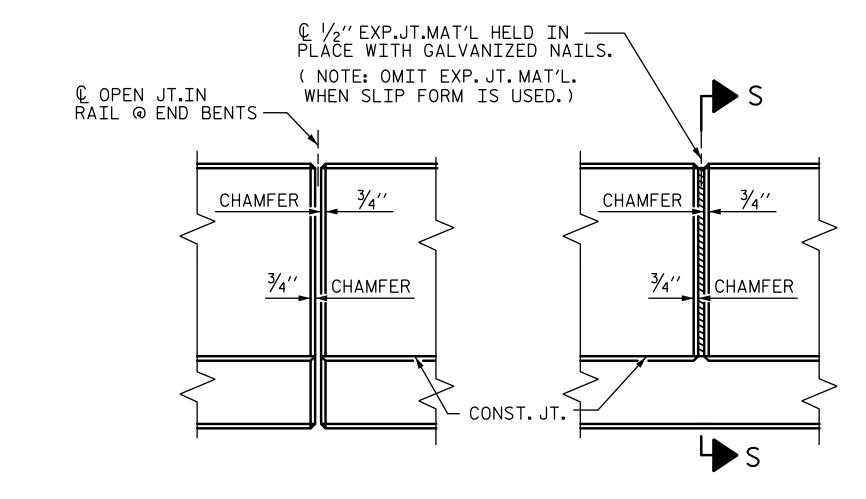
DETAILS PRESTRESSED CONCRETE GIRDERS SUPERSTRUCTURE
